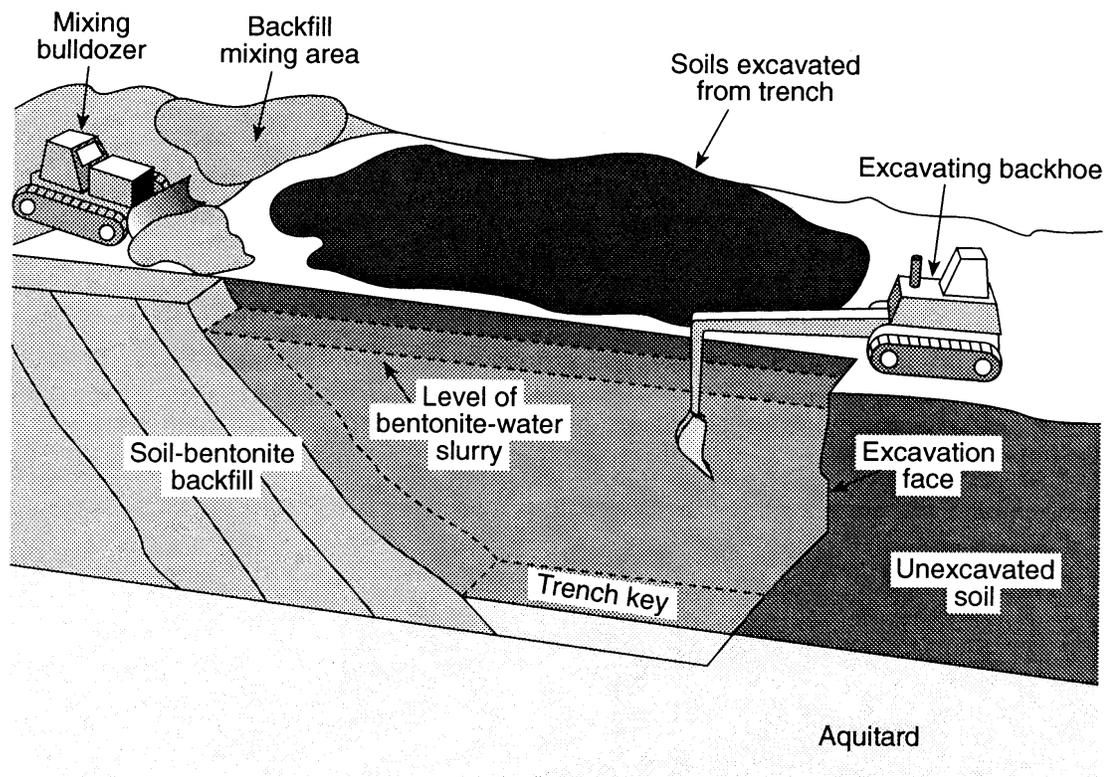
Soil-Bentonite Cutoff Wall Construction Process (*Barrier 1995*)
